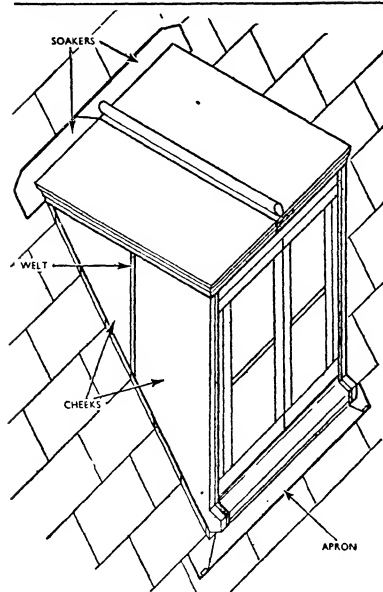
(above). Leadwork on a dormer window built on a timber-frame roof.
